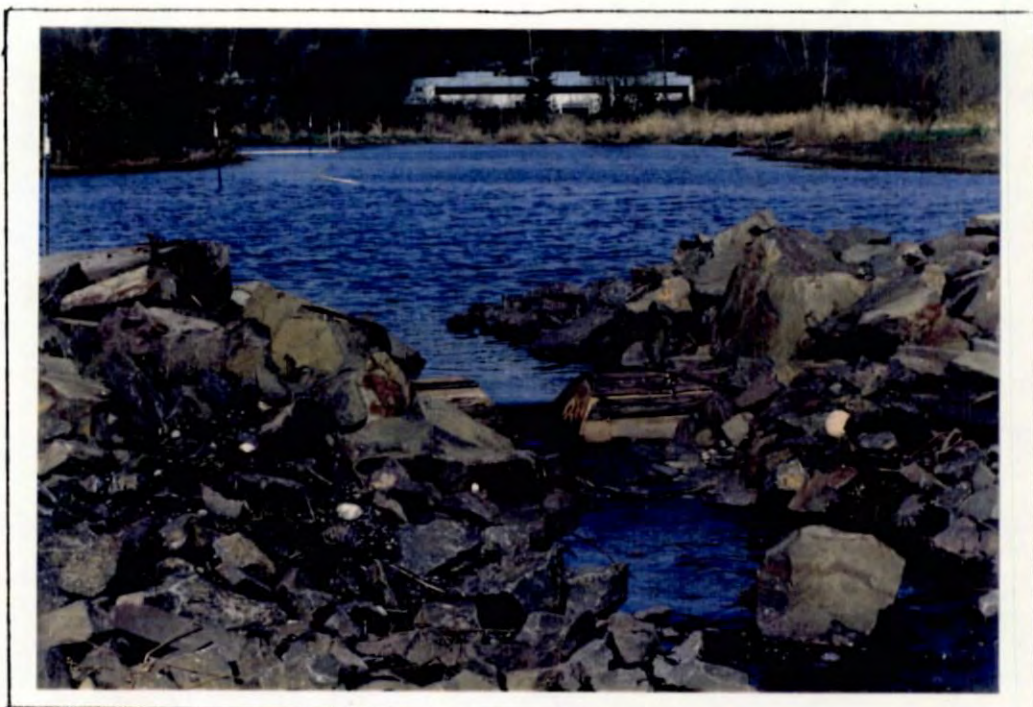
Outlet structure - Looking north into flooded wetland, May 1992.
